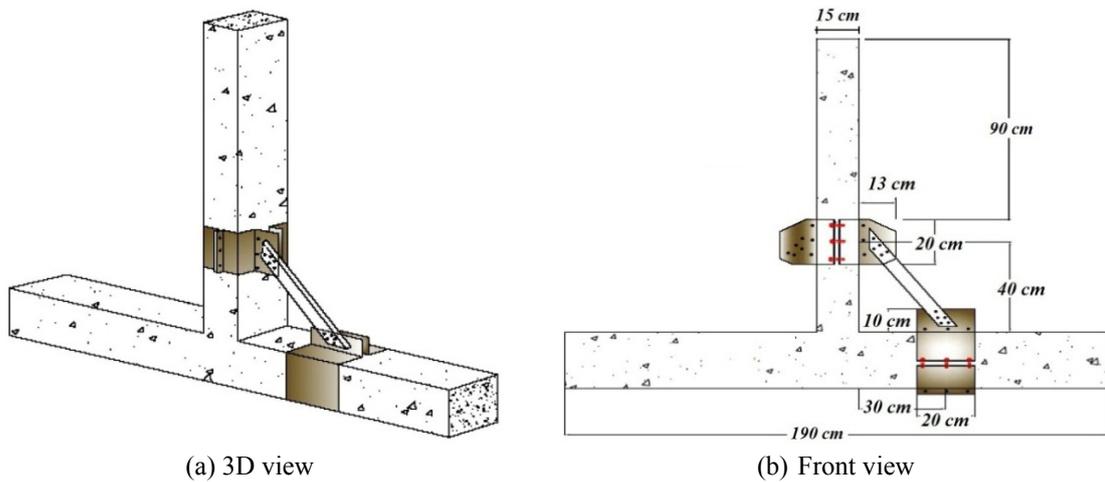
Schematic views of SRCC-1 specimen and its dimensions
